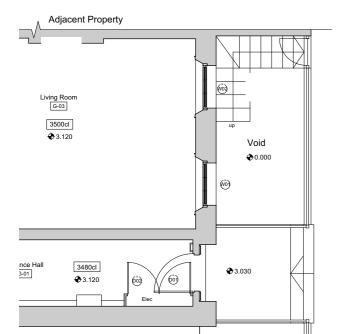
Existing Ground Floor Plan - Elec. Cupboard
